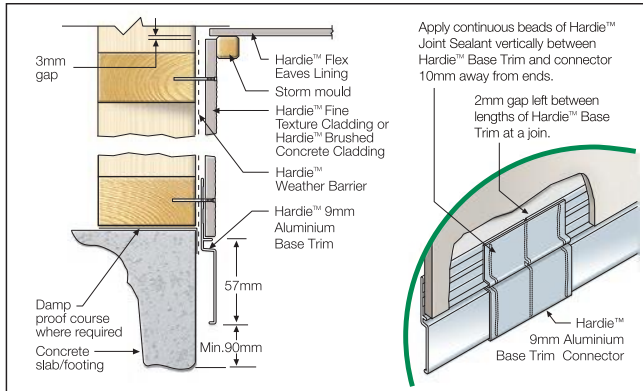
SLAB/EAVE JUNCTION DETAIL
